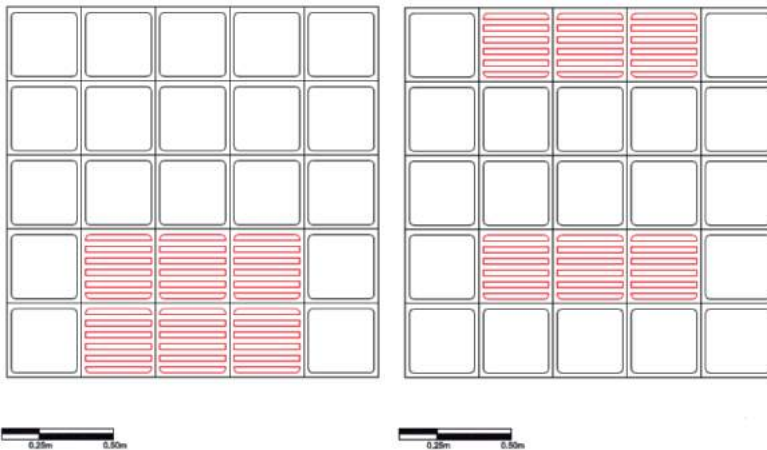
Case 1A: Ventilated window-sill. Figure 7. Case 1B: Three ventilation modules positioned above and three below the façade.
